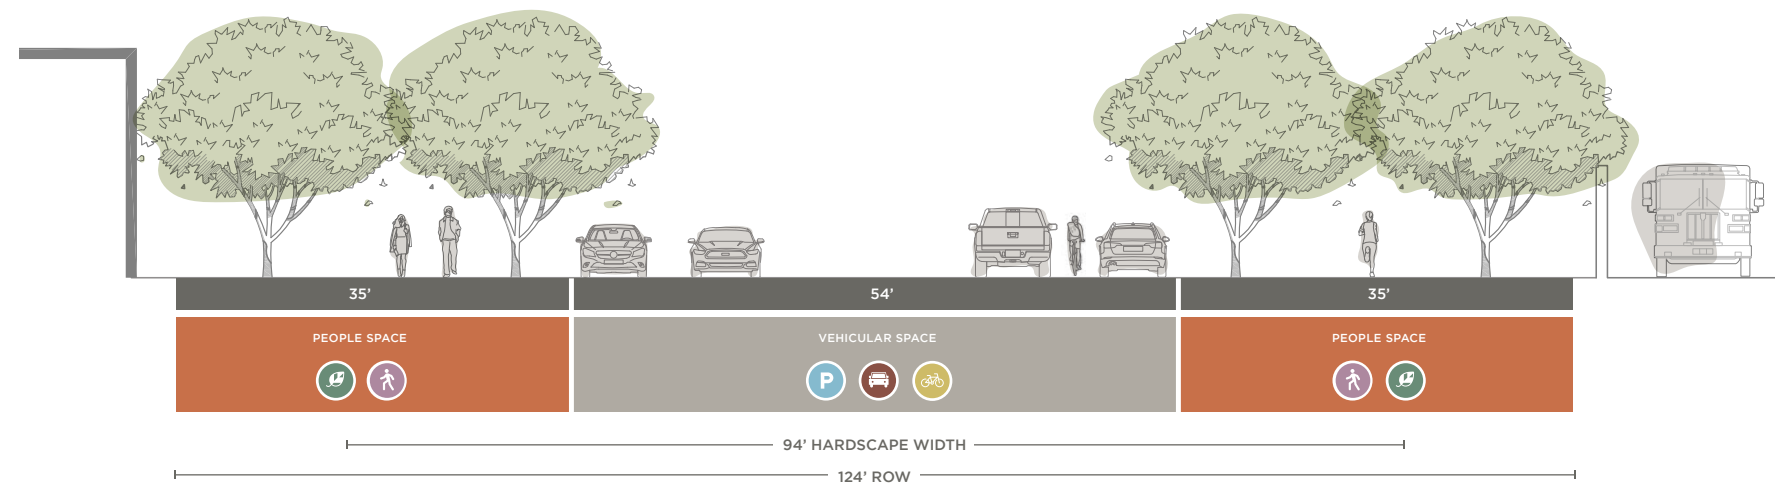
Japantown Street Concept Option A and Roadway Section
